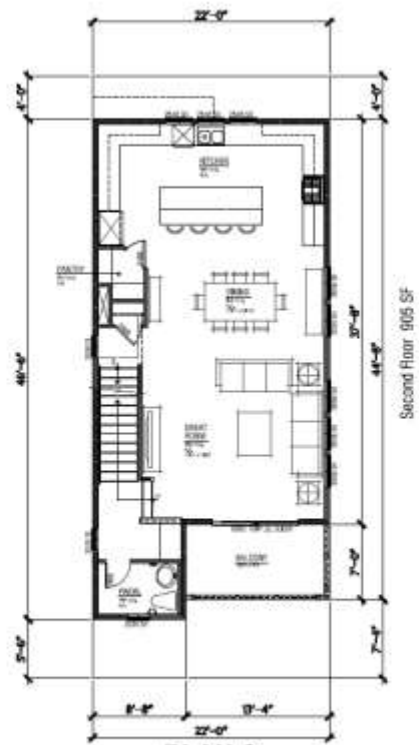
Conceptual Elevations and Floor Plans- Plan 3
